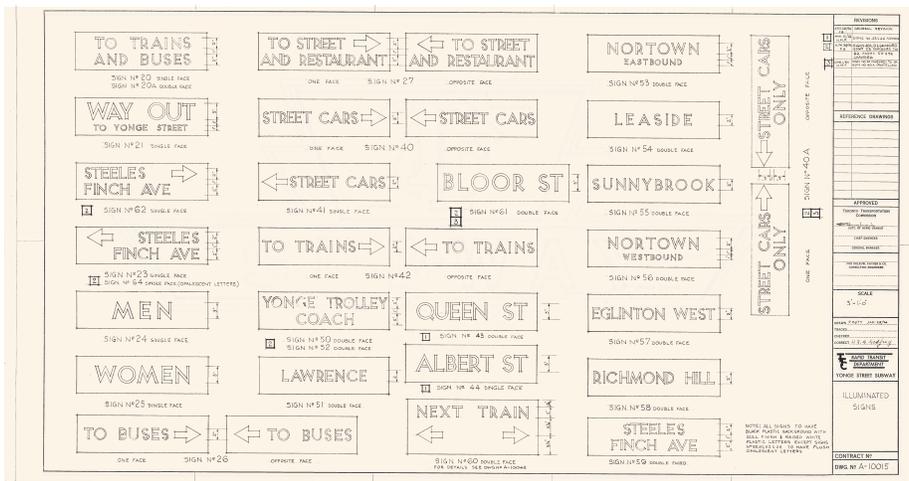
Details of illuminated fascia signs planned for the Yonge Street Subway line circa 1954 - TTC Engineering, Construction & Expansion
